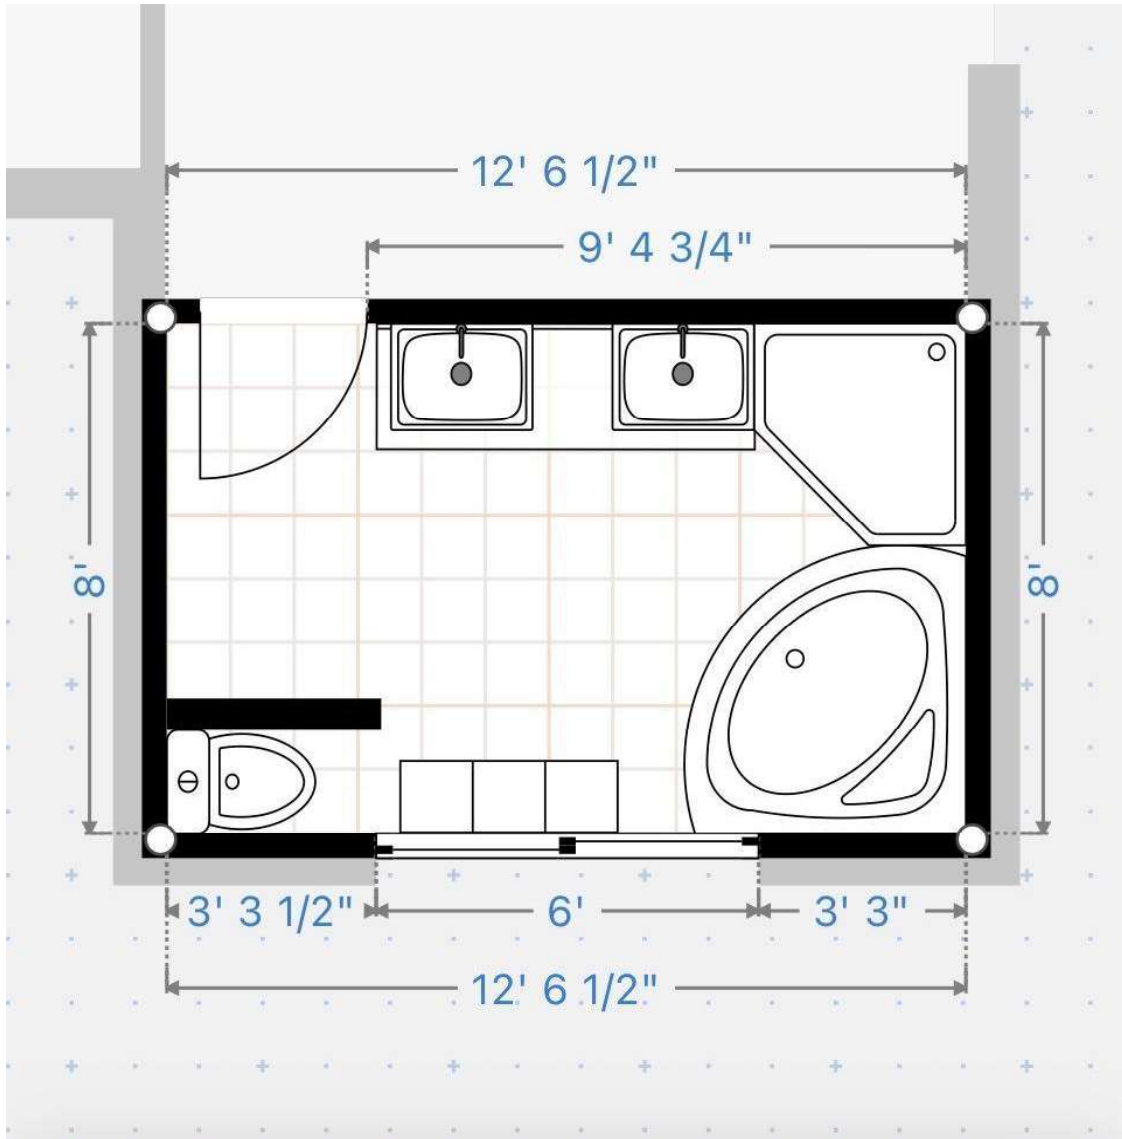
Proposed bathroom layout with dimensions: 12'6" wide x 8' deep within a 12' x 12' total addition footprint; current plans are 10'x12' with 2-foot buffer requested
